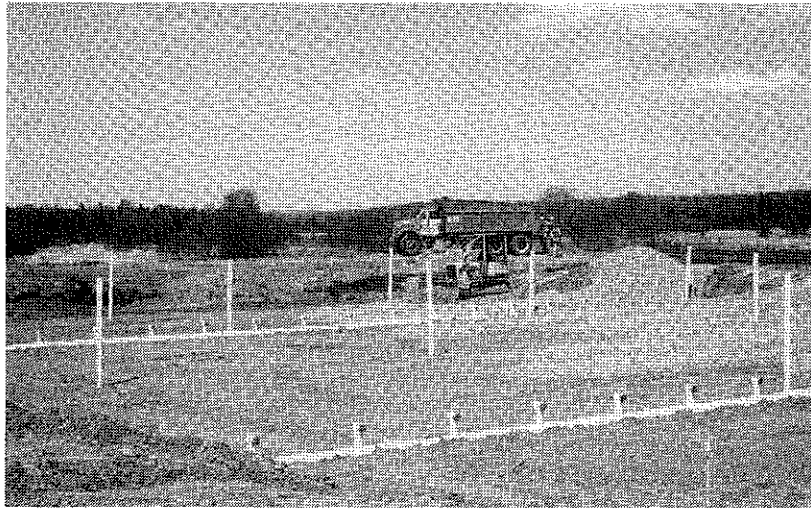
Soil Absorption Bed Construction With Manifold and Lateral Connections In Place (Observation Pipes Are Standing Vertically)
